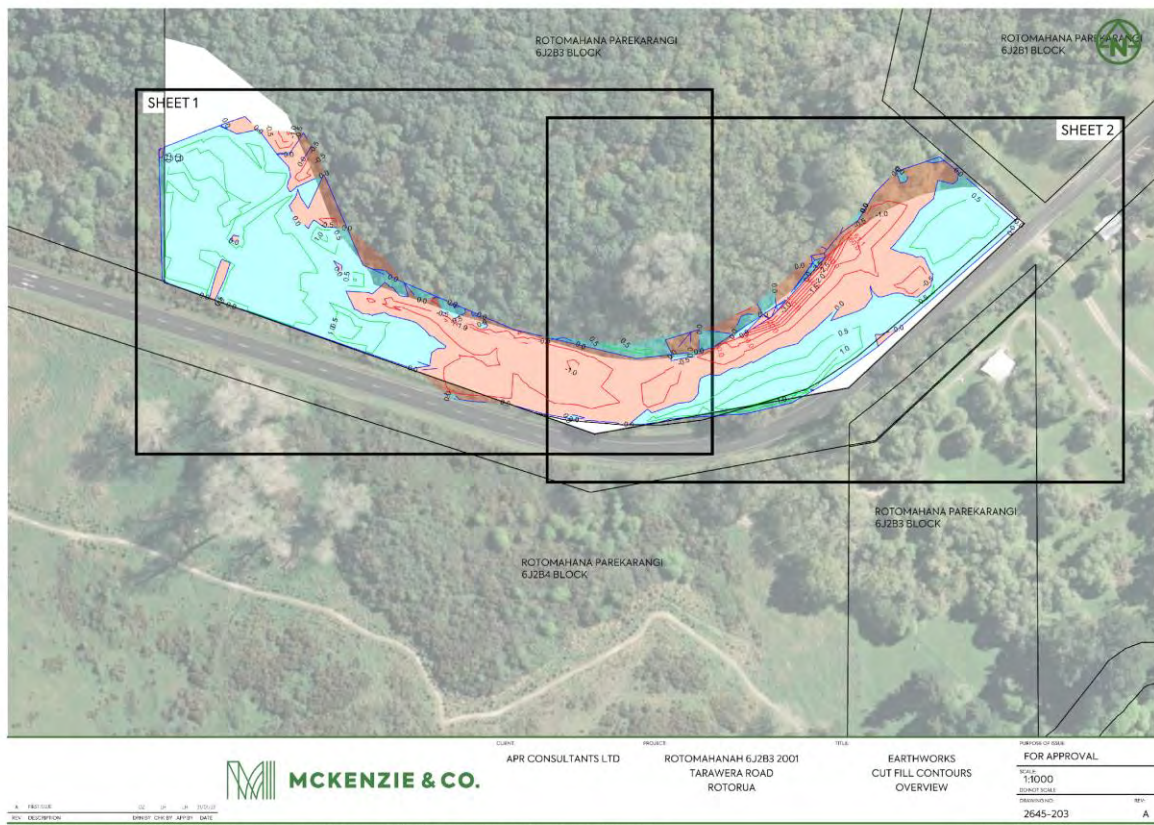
Proposed cut and fill earthworks plan overview, pending approval. Source, McKenzie and Co.
